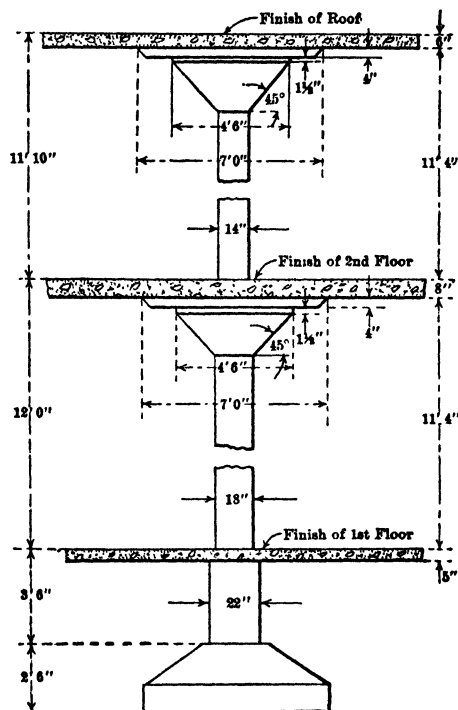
Flat Slab Construction. Vertical Section Showing Column Caps and Drops
